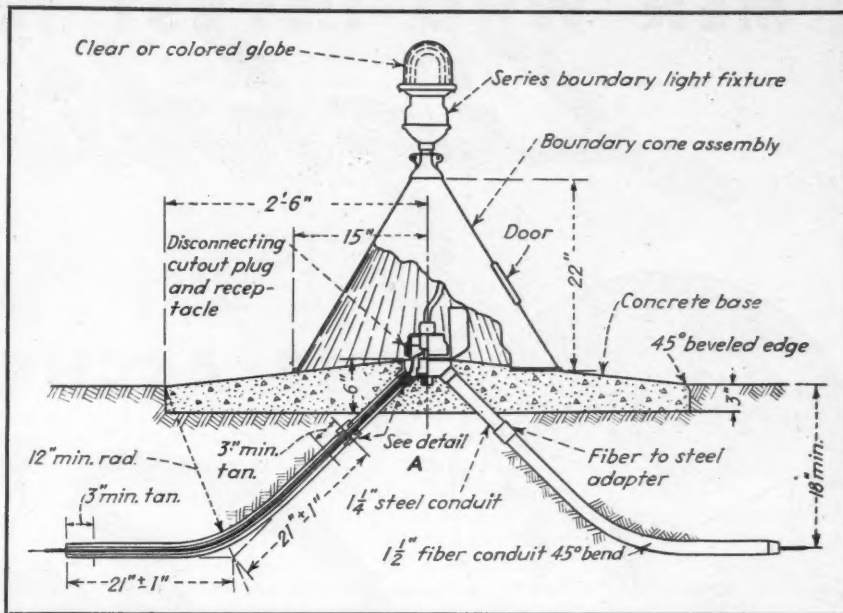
Underground connections to airport tip-over boundary light units. Details show method of providing mechanical protection to cables entering the cut-out receptacle.
